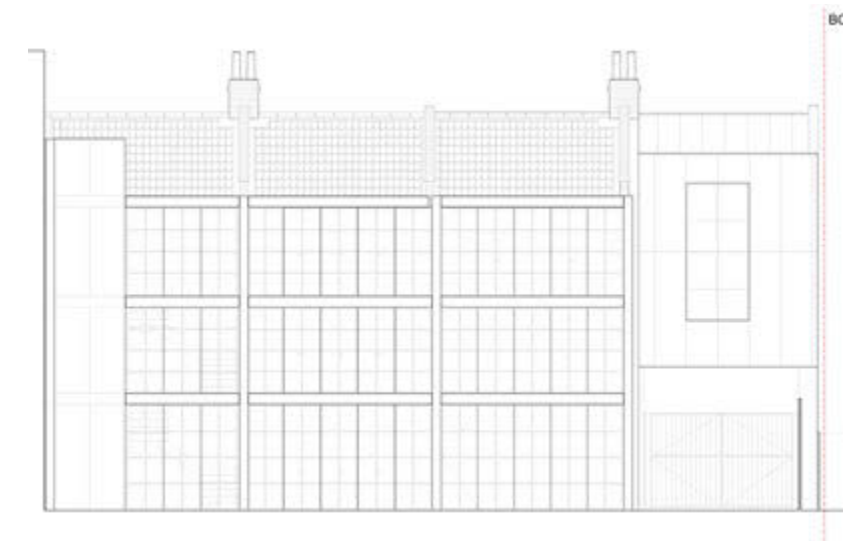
Weavers Cottages - Proposed rear elevation
